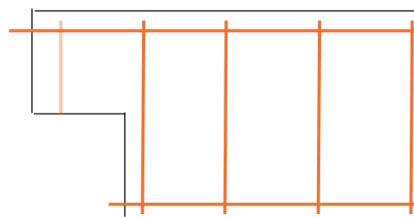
Reused tooth shape sketch of the existing reinforcement
